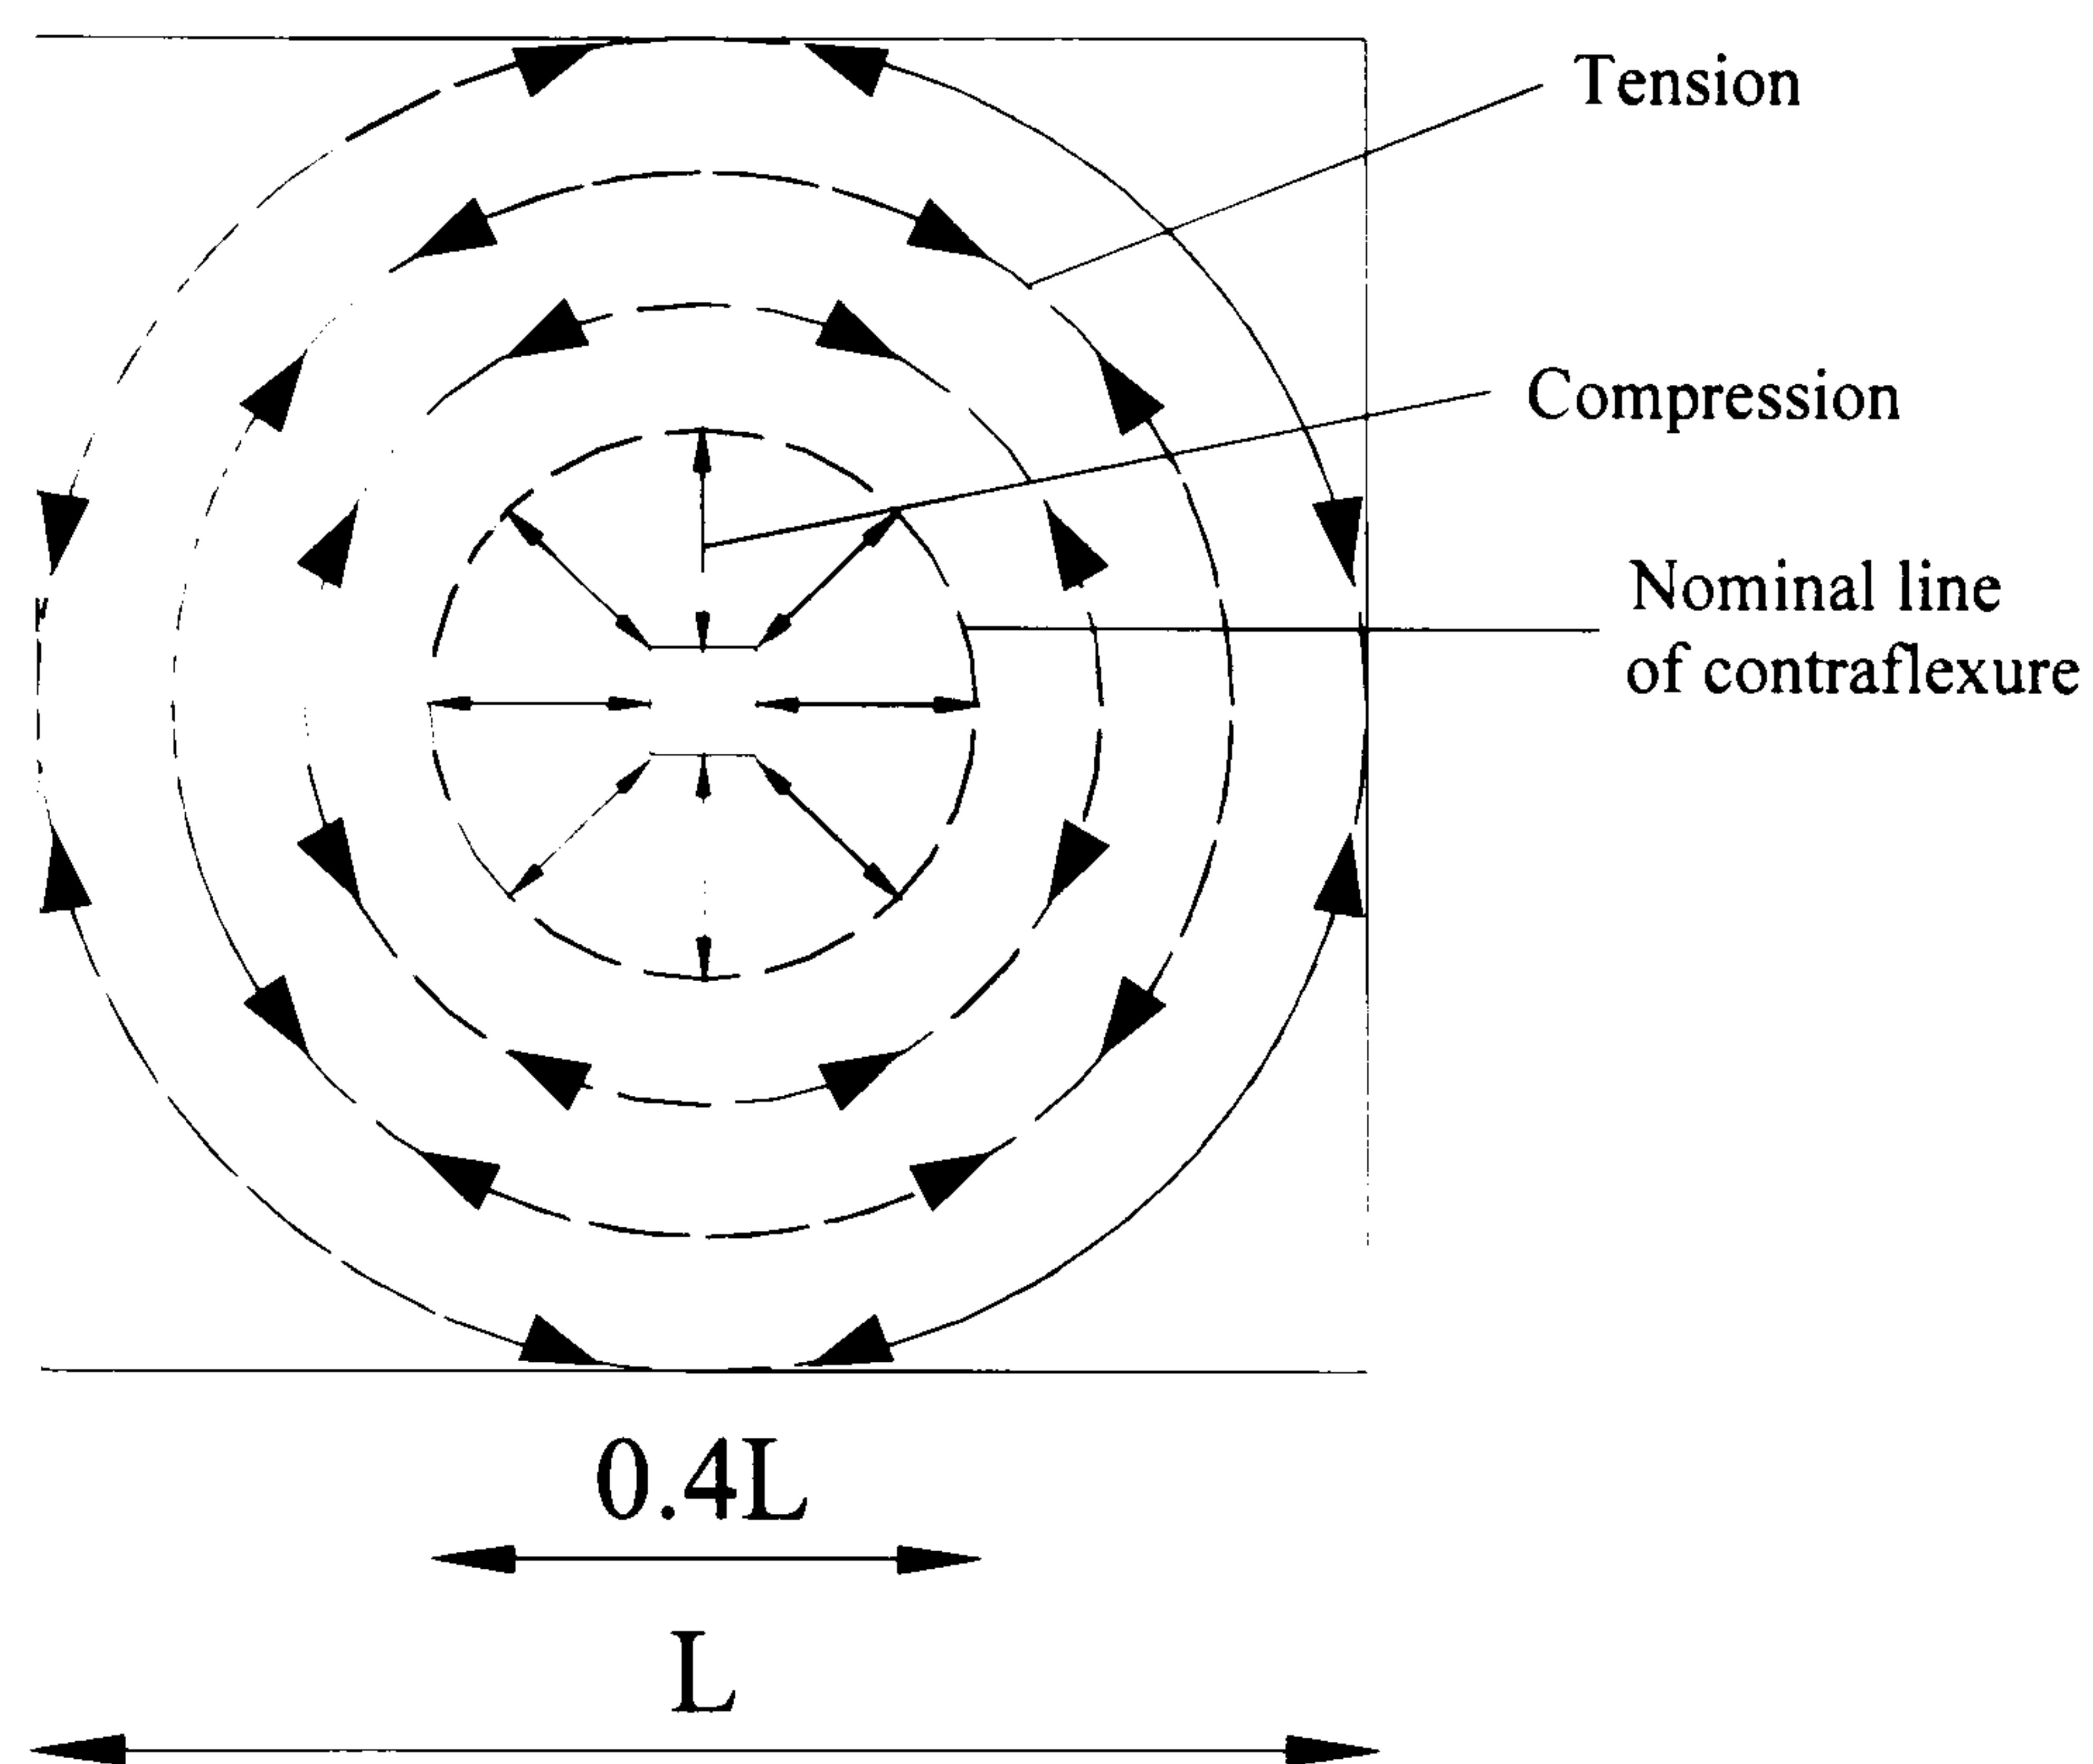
Concept of compressive membrane action at interior slab-column connection [81]
